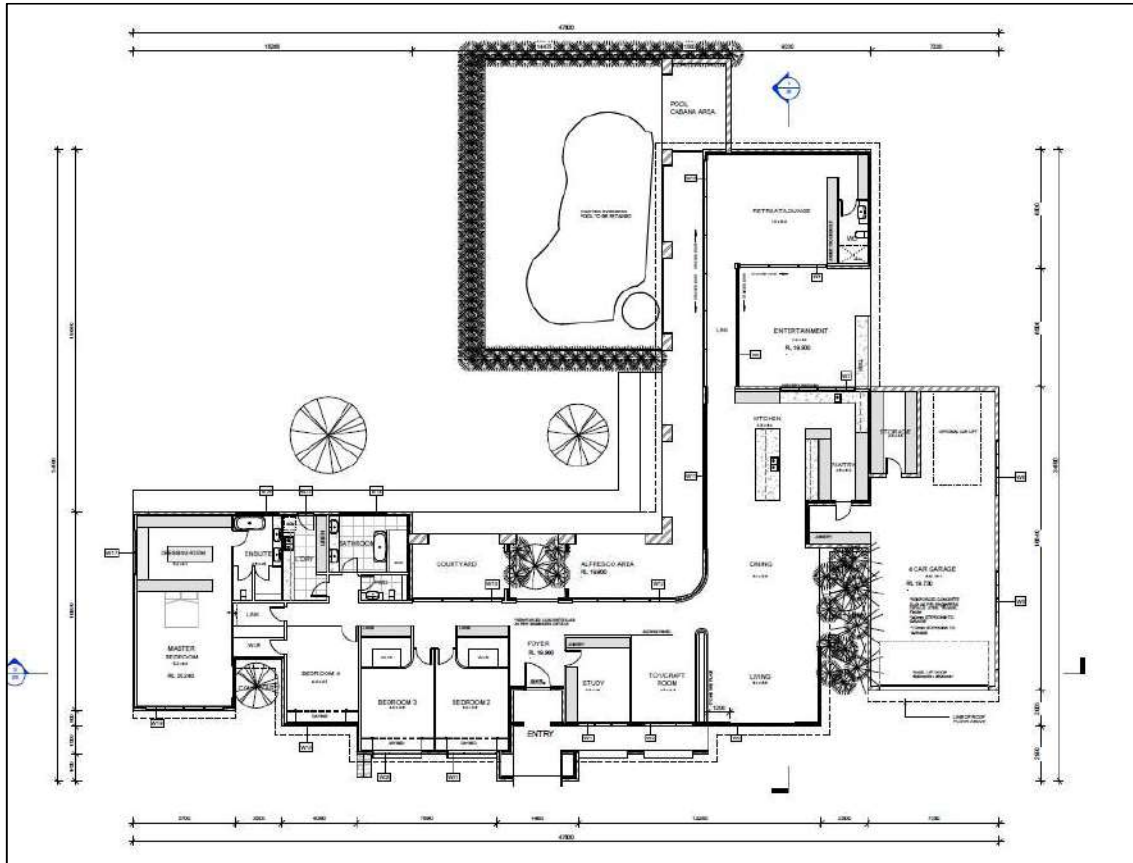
FLOOR PLAN OF PROPOSED DWELLINGS
